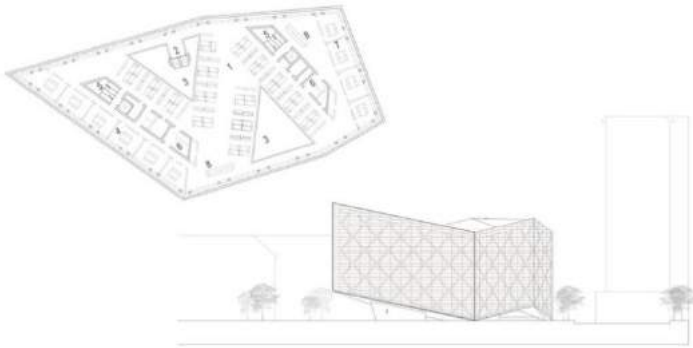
The Crystal, Copenhagen- floor plan and elevation
